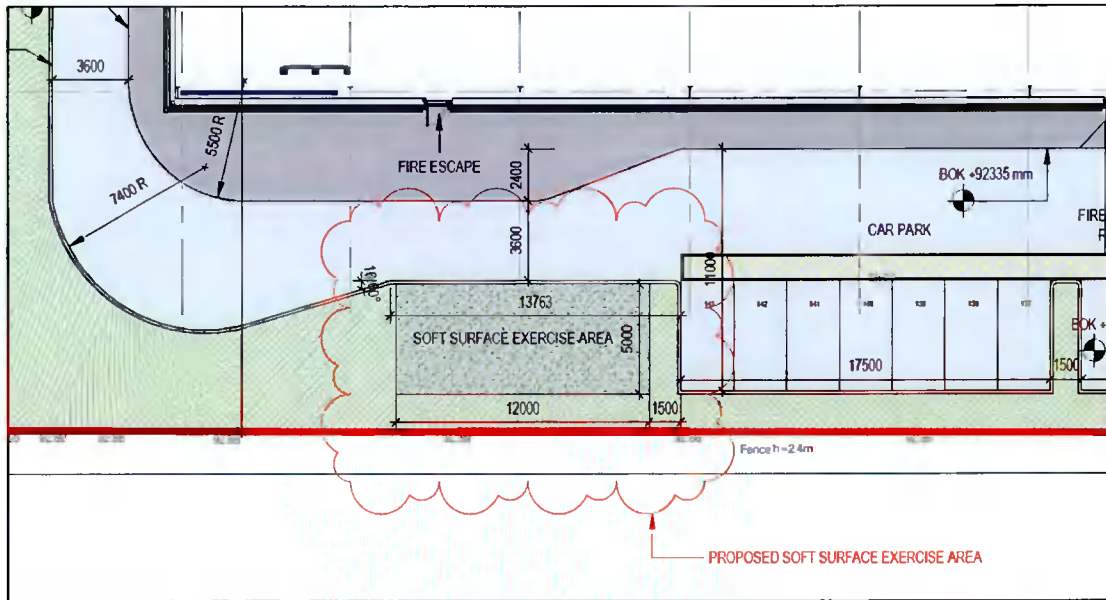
Proposed Soft-Surface Exercise Area (Extract from Proposed Site Plan Drawing, No. ABPUQ2-DTM-DR-TOT-AR-103)
